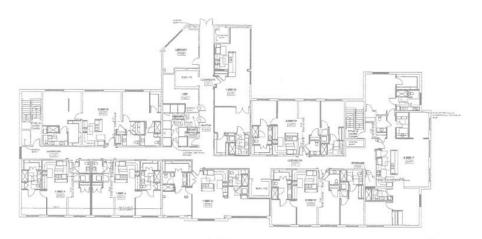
Interior, 2000 Section, 1st Floor Photo Key (Photo 32)
